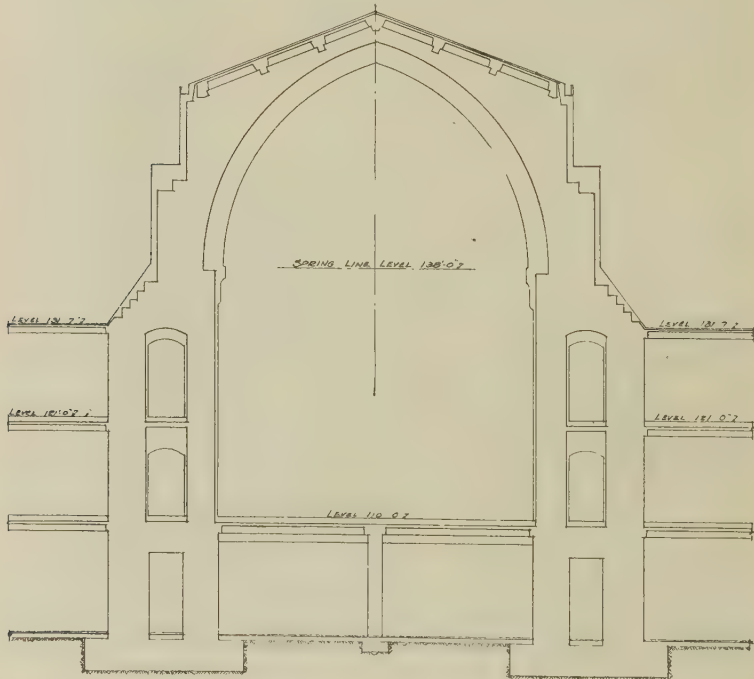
CONCRETE FRAME, EUCLID METHODIST CHURCH, CLEVELAND.
